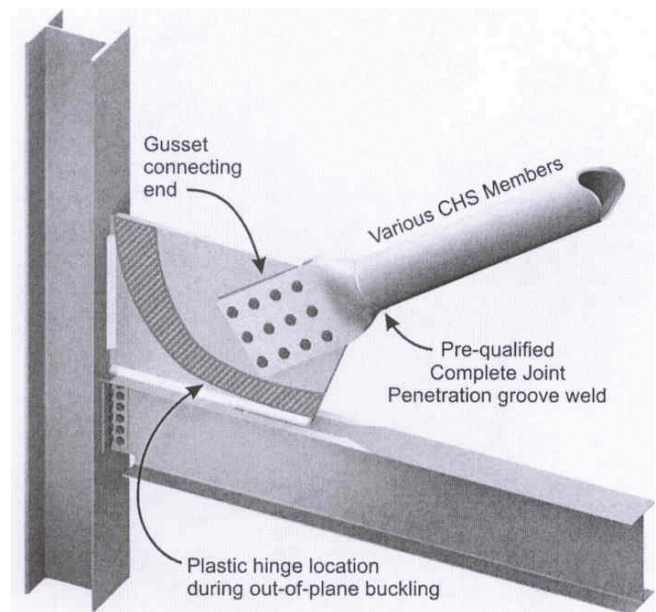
Bracing connection with cast steel connecting element between gusset plate and tubular bracing member (courtesy of Professor J.A. Packer).
